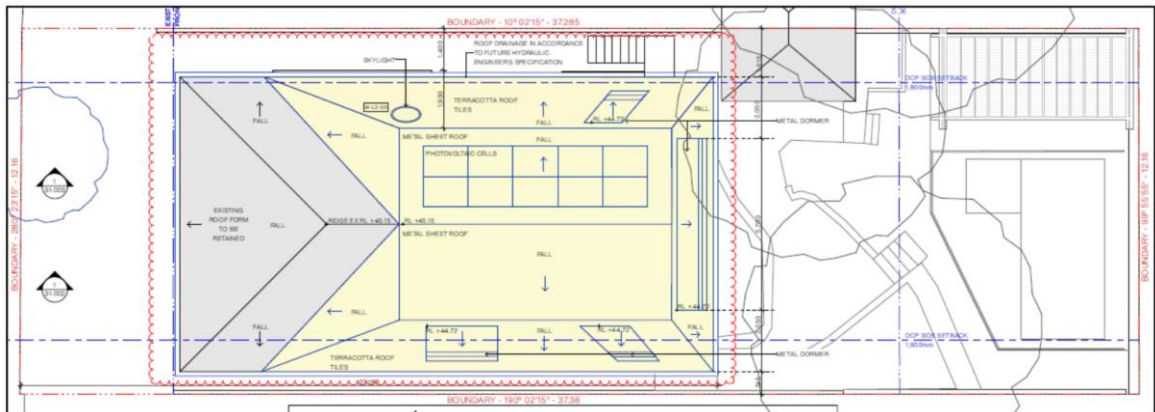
Roof plan - 10 Moore Street (Source: Tribe Studios)
